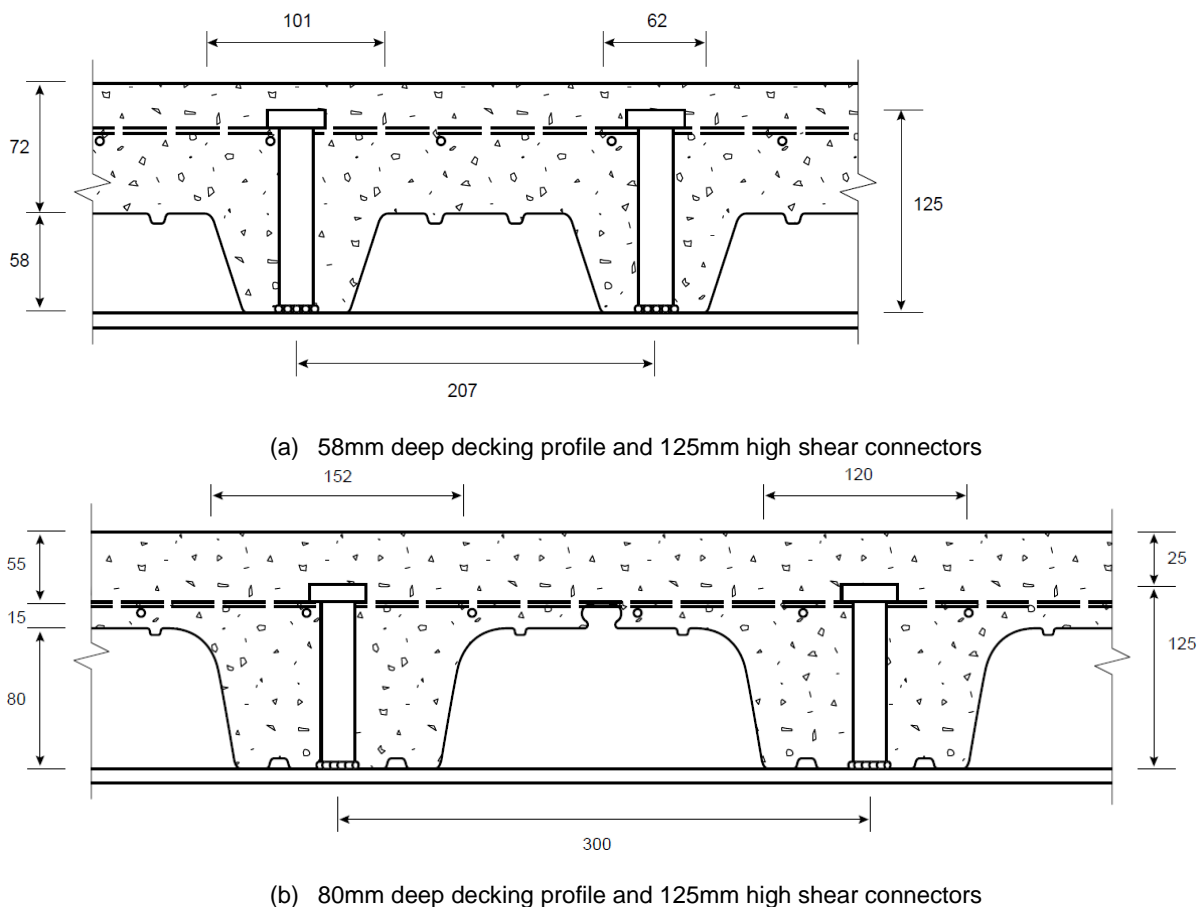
Details of the trapezoidal deck profiles used in the push tests and beam tests
